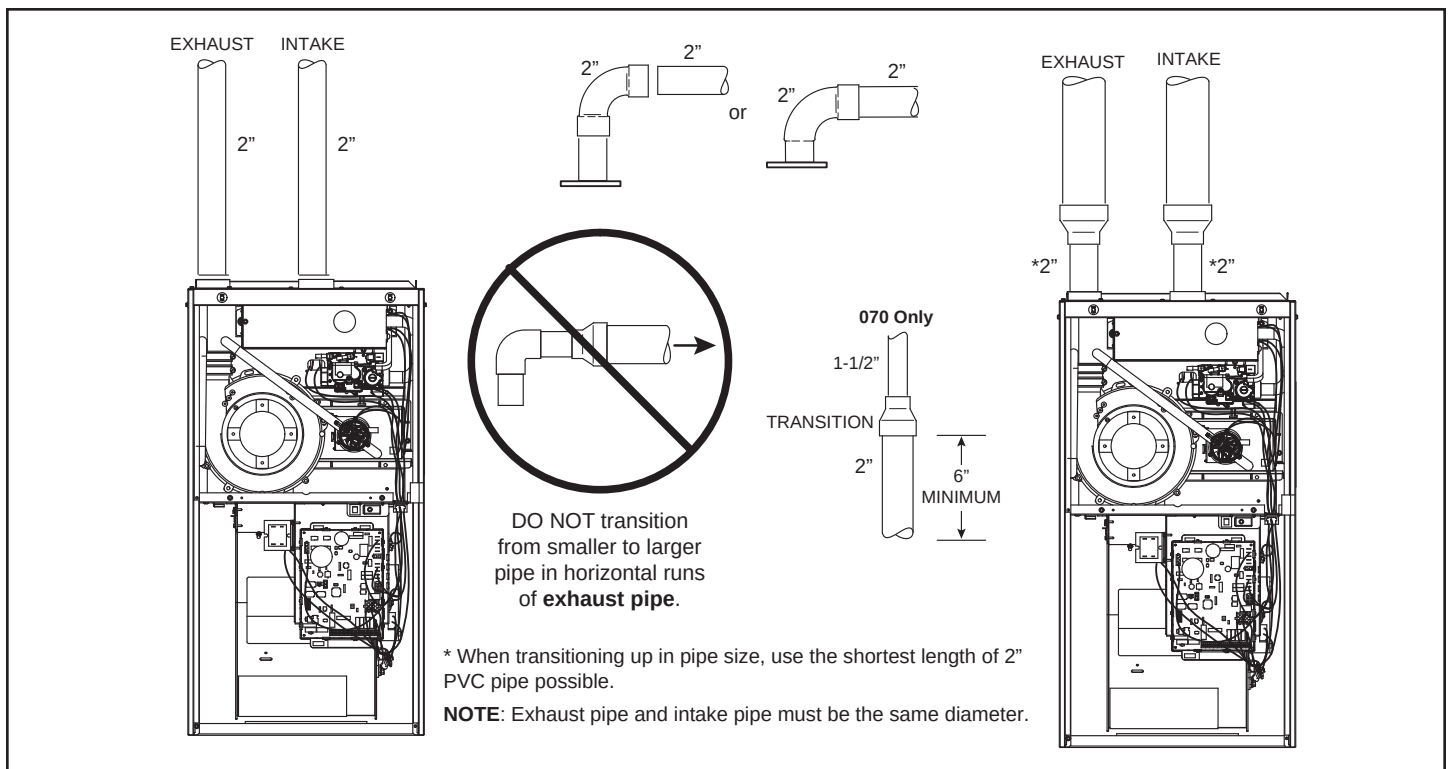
Typical Exhaust and Intake Pipe Connections and Condensate Trap Installation in Upflow Applications
